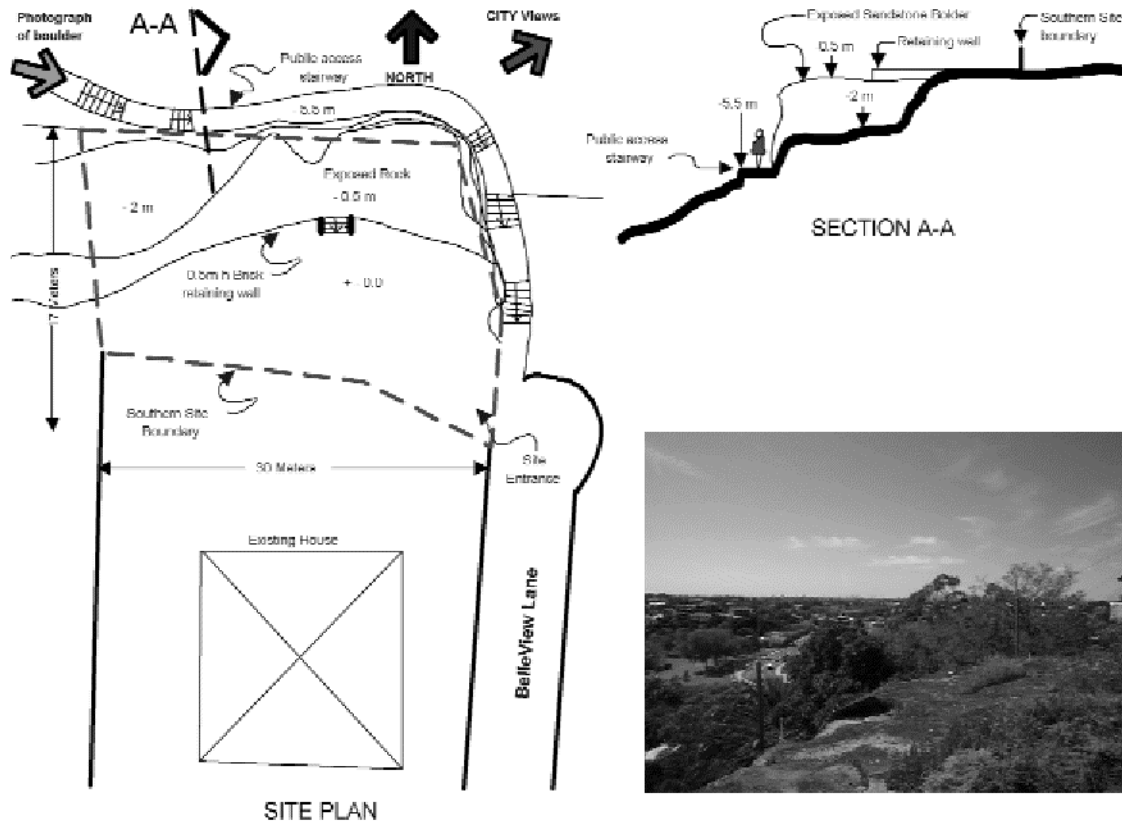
The site plan, section (NTS) and photograph (taken from site) showing aspect and views towards city.
